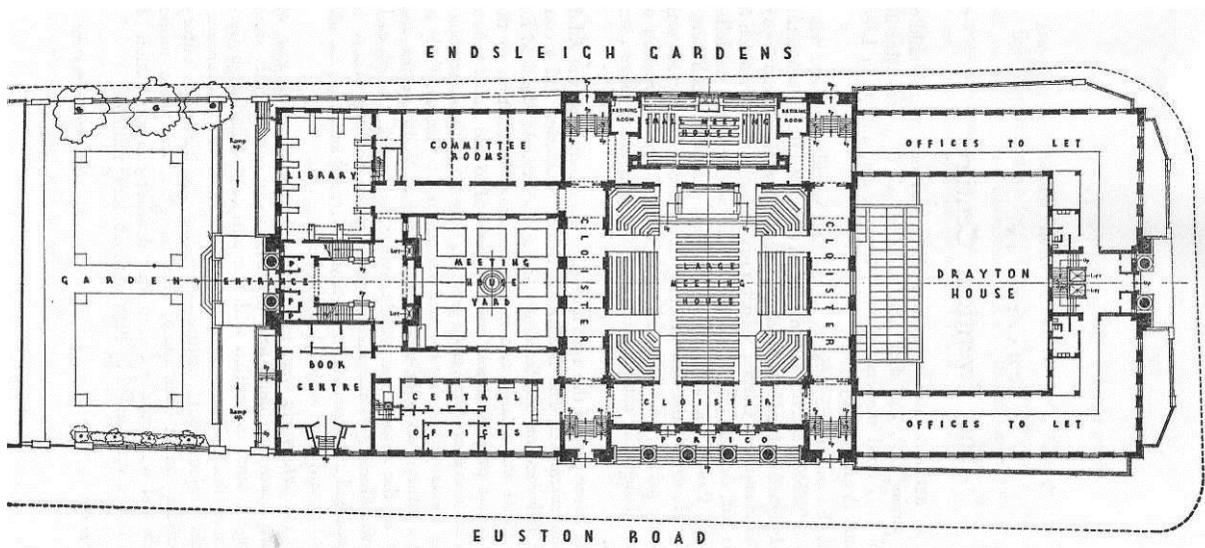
The ground floor plan as built. Northwest is at the bottom (Lidbetter, p. 41)
